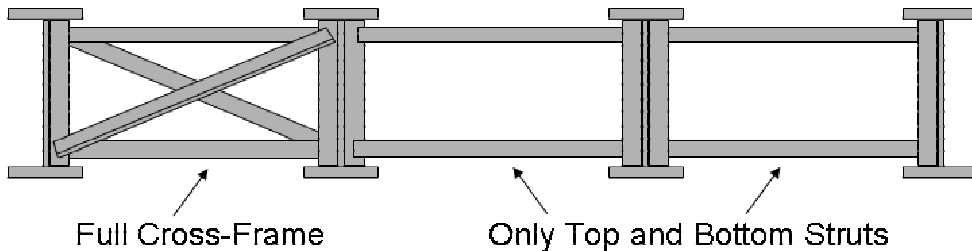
Lean-on Bracing System Allows Four Girders to be Braced by One Cross-Frame
